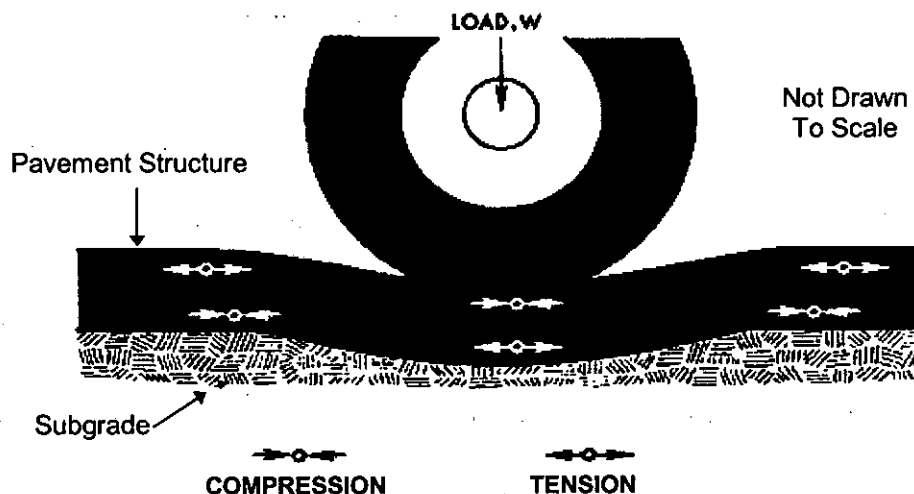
Pavement deflection results in tensile and compressive stresses in pavement structure
